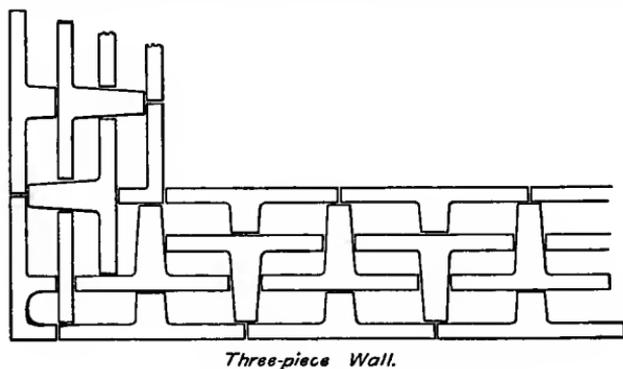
TOP VIEW OF THREE-PIECE WALL.
